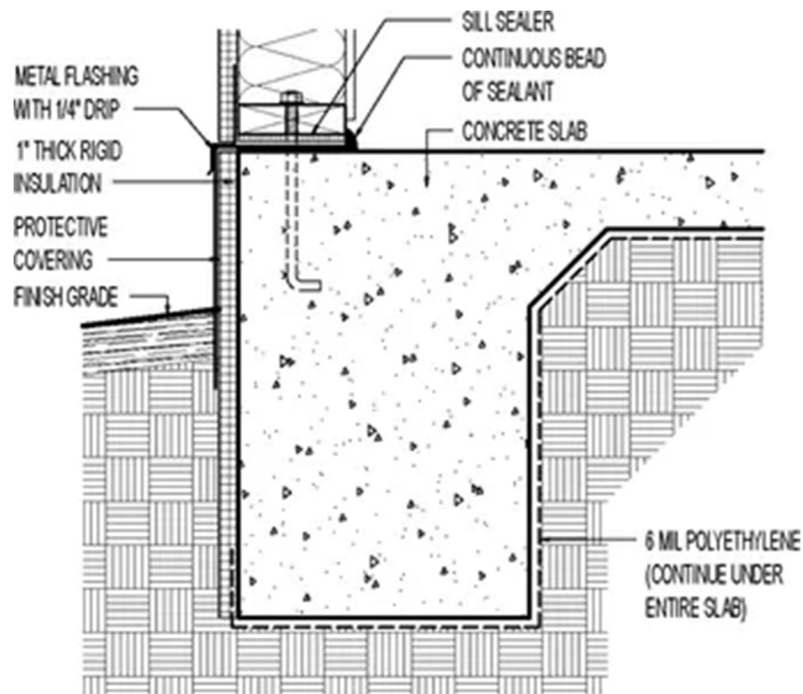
Monolithic Slab-on-Grade Foundation Detail
